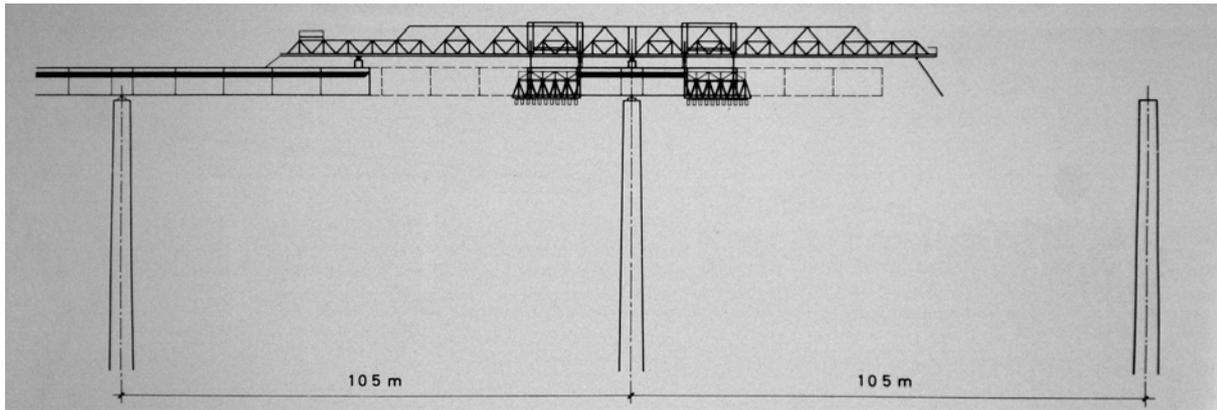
Diagram showing concreting sequence for the construction of the Siegtal Bridge at Eiserfeld, Germany using span-by-span launching gantry designed for long spans. (Wittfoht)
